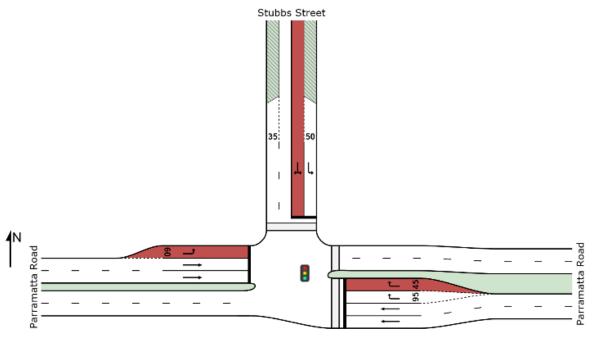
Intersection of Parramatta Road and Stubbs Street
